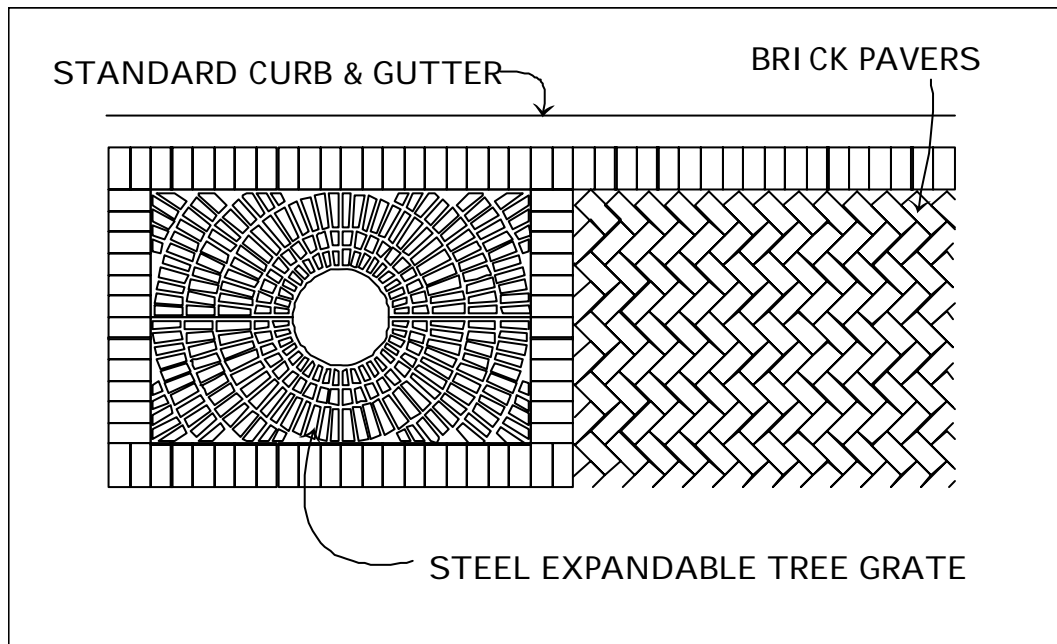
Plan View-Standard Tree Grate and Concrete Paver Sidewalk
